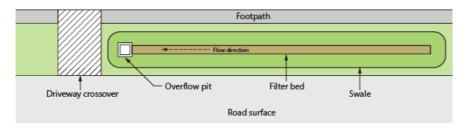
Typical layout of a bioretention swale located within a street nature strip.
